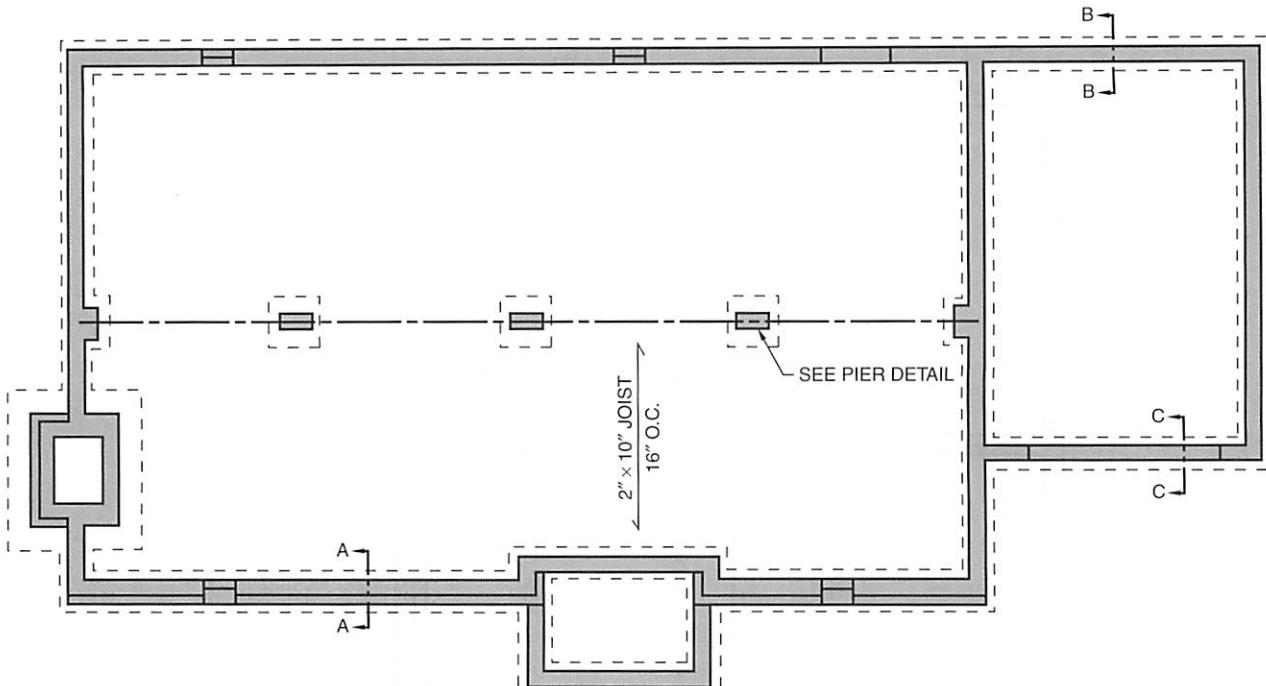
Footings for the foundation walls and the piers, the supporting beam, all section symbols, and the floor joist data have been added to the foundation plan.
